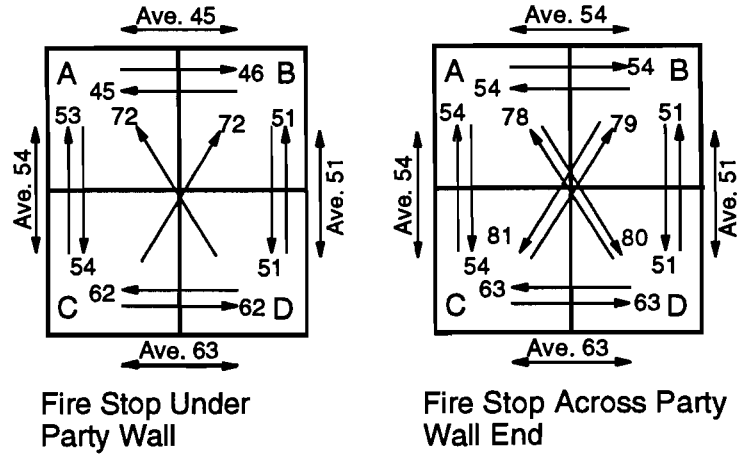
Base Case with a fire stop at the flanking wall: Plan view of the flanking and party walls.
